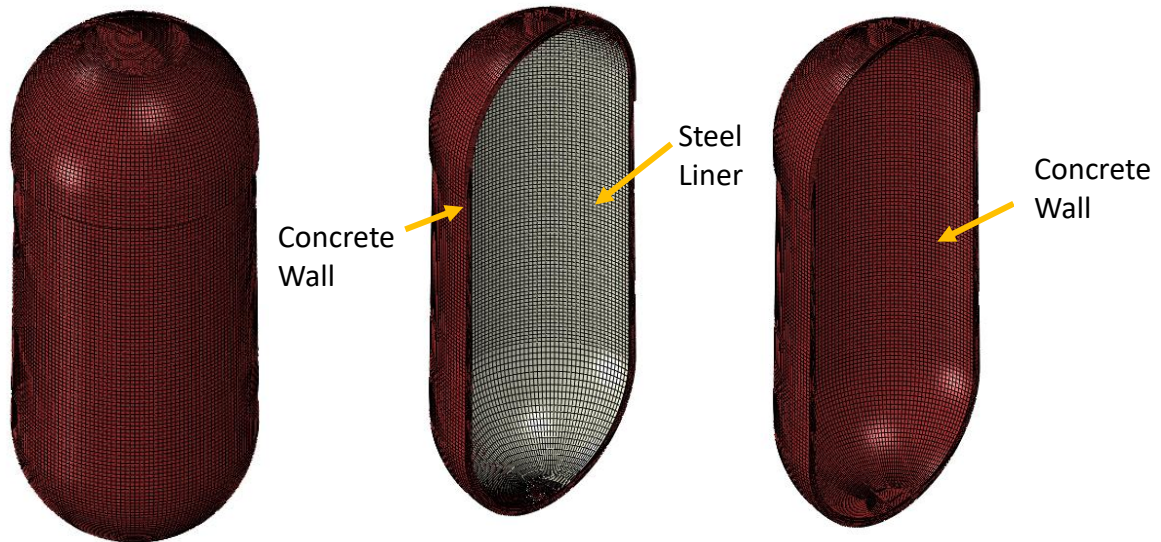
Finite Element Model of Typical Underground Storage Tank
